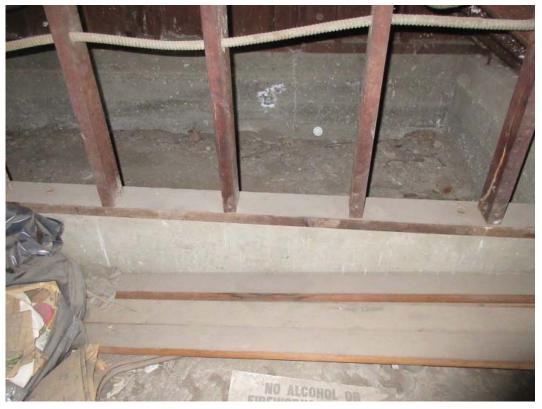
Close up of north wall sill plates with anchor bolts, plywood, and stud framing below rear stage platform.
